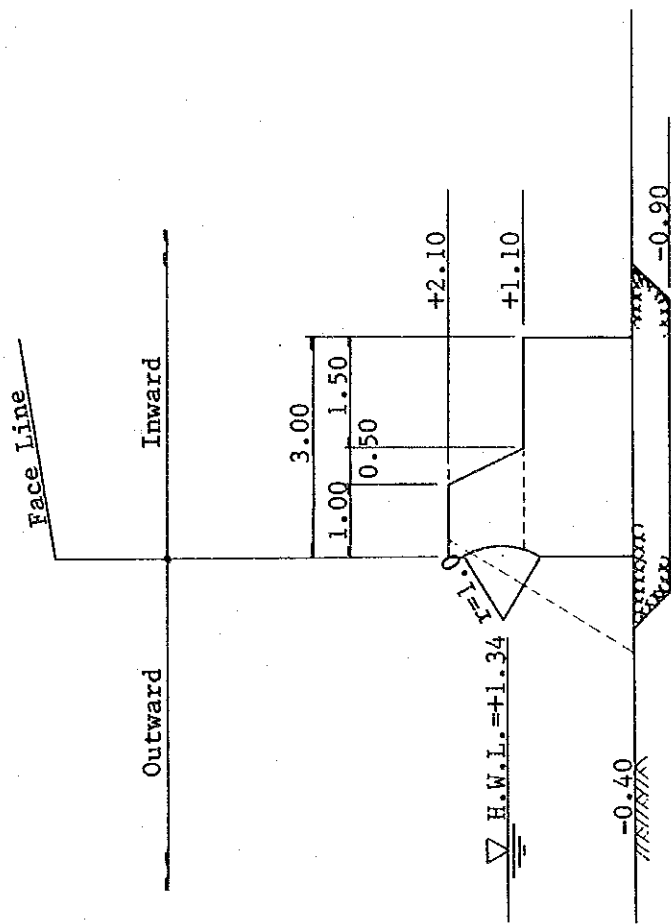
Typical Section of North Coast : Breakwater (S=1:100)
